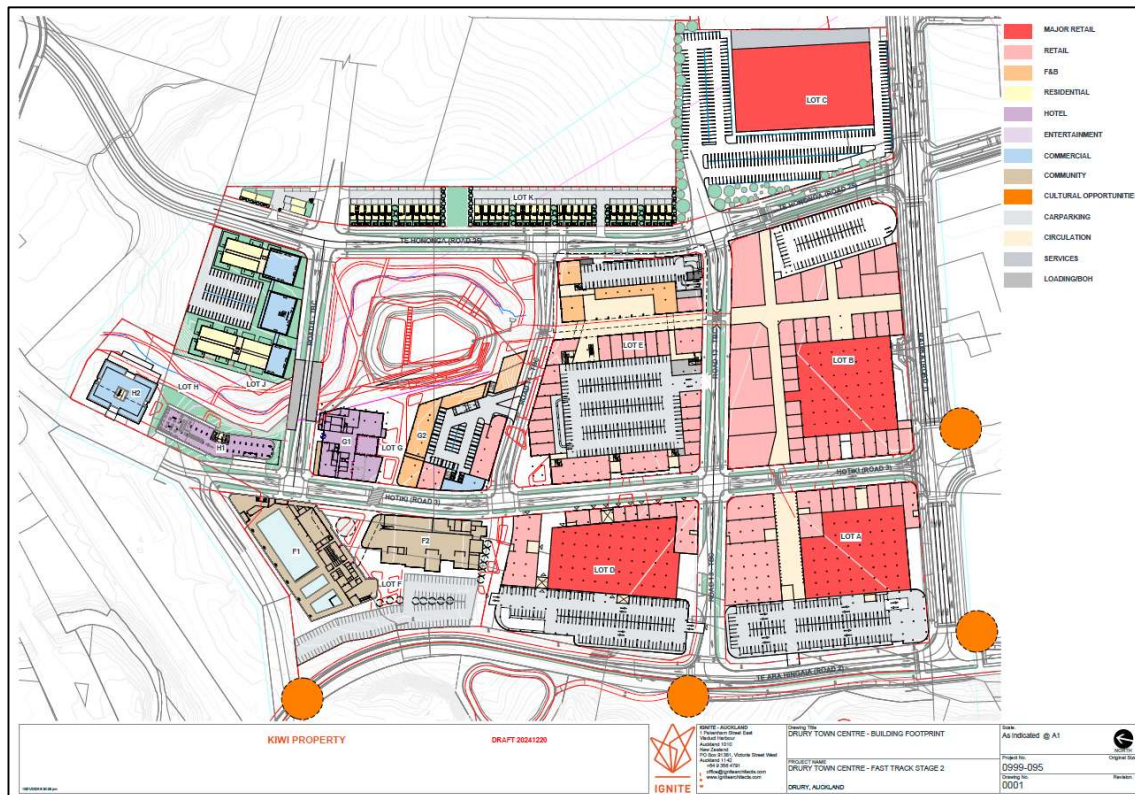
STAGE 2 MASTERPLAN LAYOUT (PREPARED BY IGNITE)
